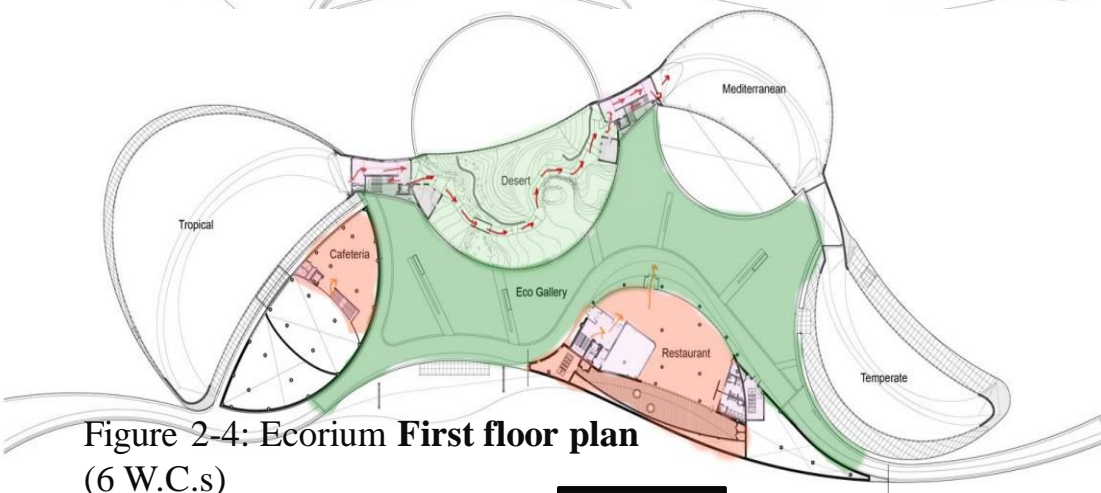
Ecorium First floor plan (6 W.C.s)
